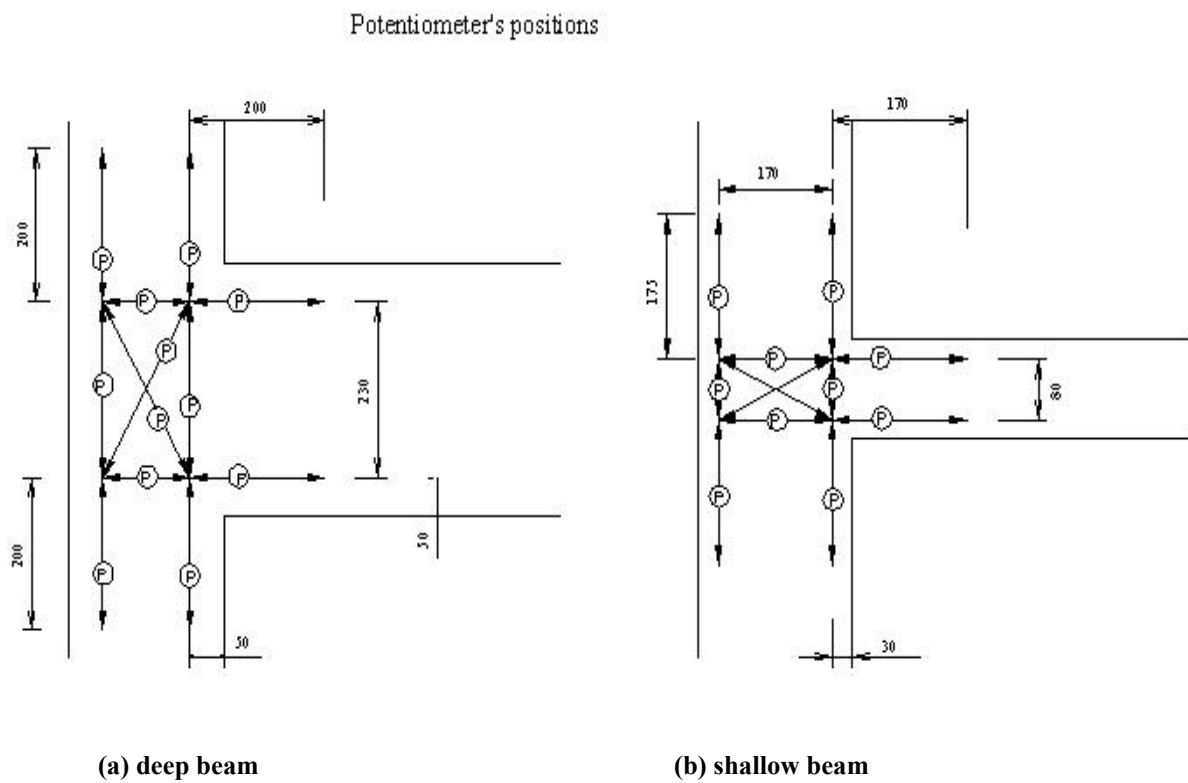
Positions of potentiometers in joint area in plane frame setup
